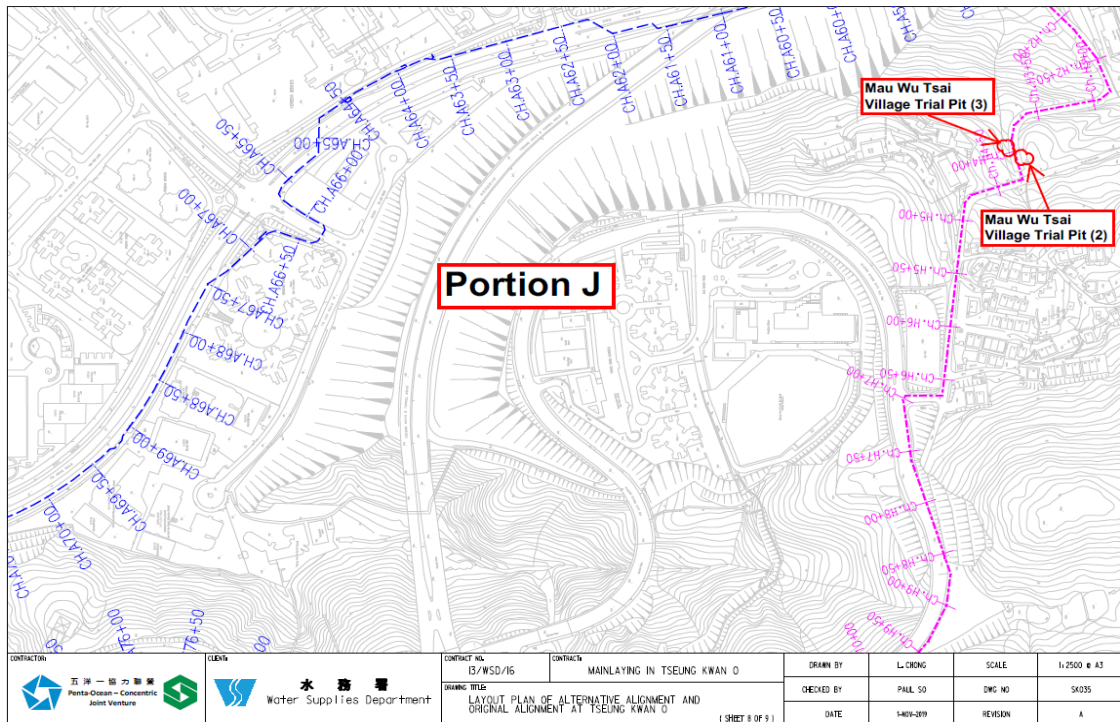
Location Plan for Mau Wu Tsai 2 & 3
